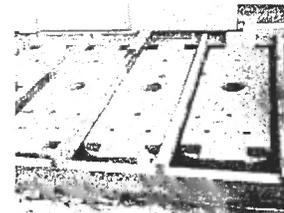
HIDDEN CISTERNS (50 GAL. CAPACITY EACH) INSTALLED WITHIN FRAME OF WOOD DECK
